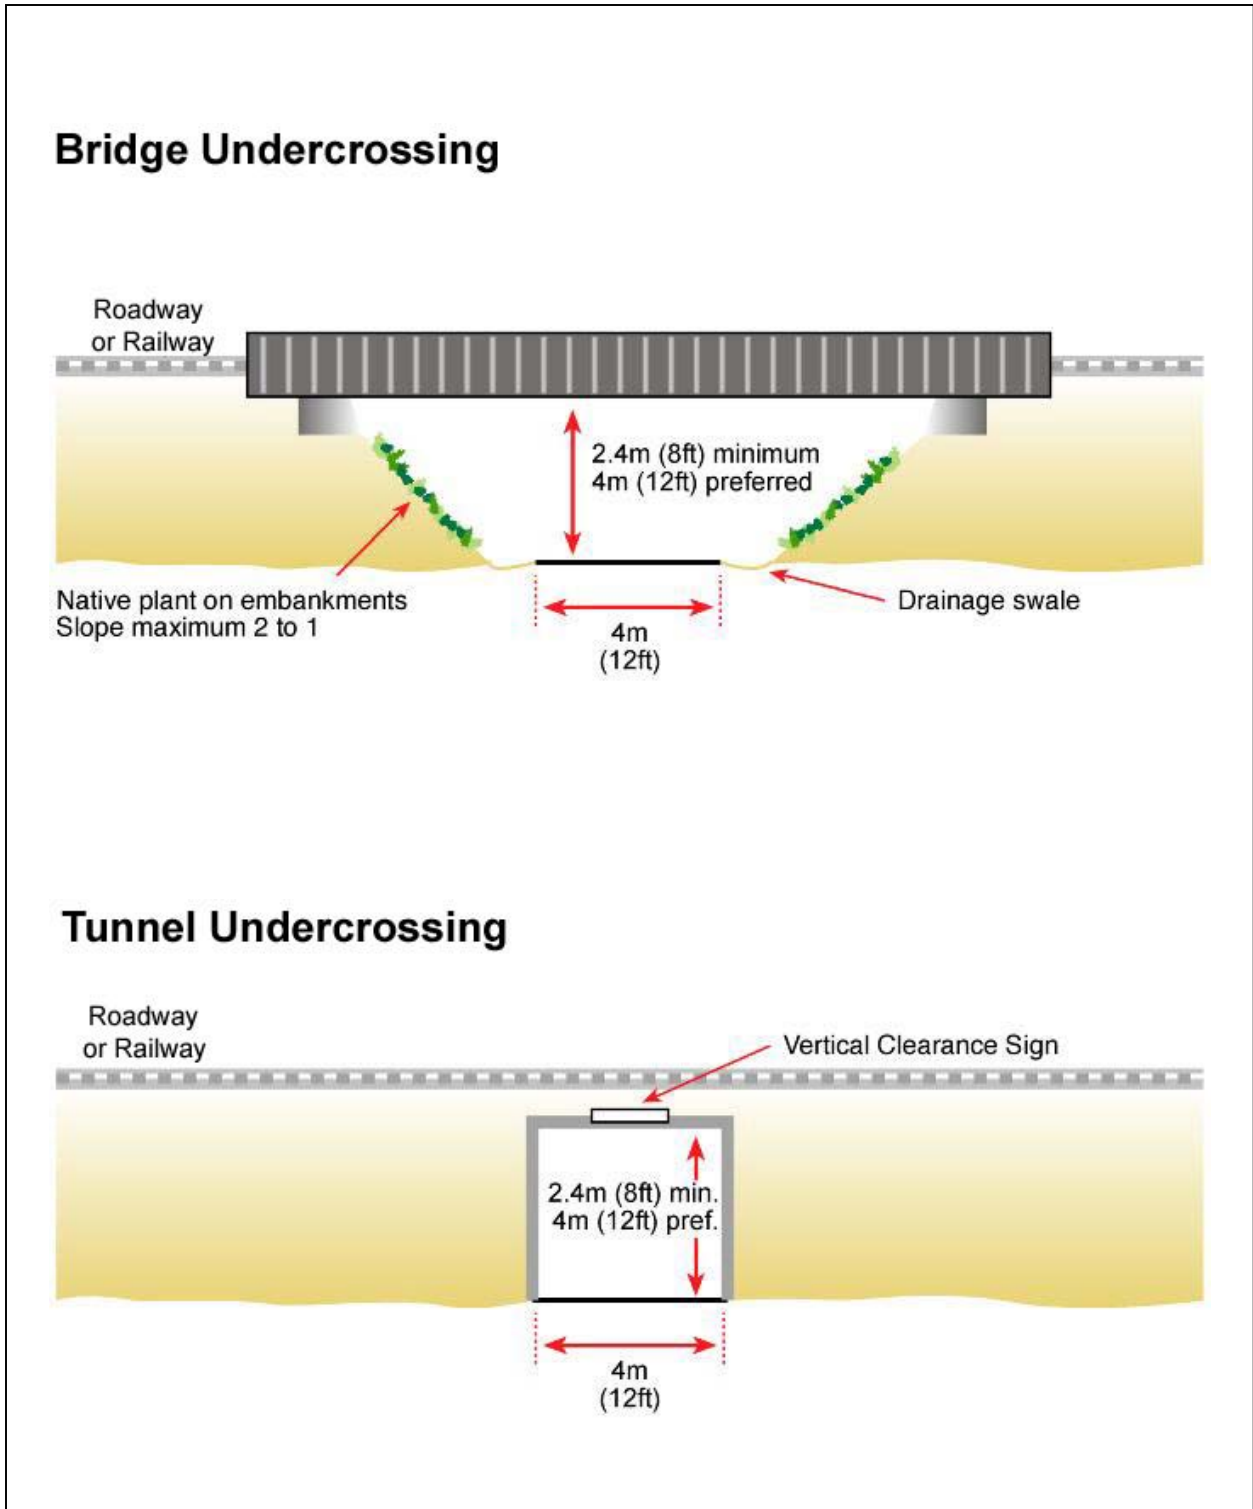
Type 4 Crossing Prototype, Undercrossings
